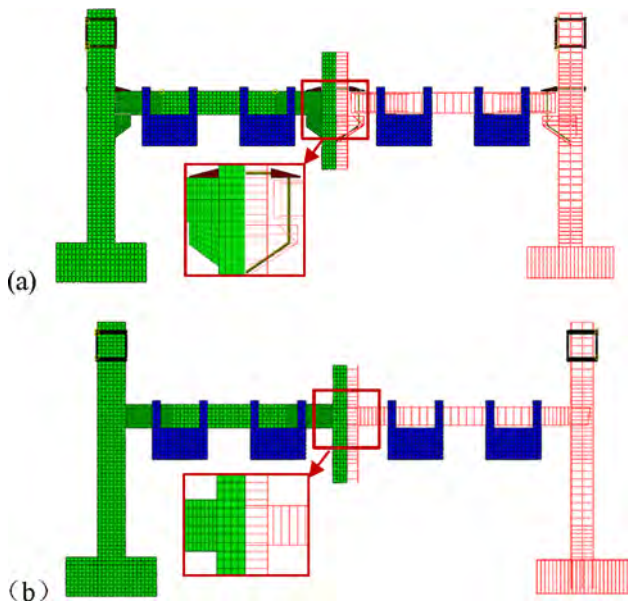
Analysis elements of reinforcement and concrete: (a) PC specimen; (b) RC specimen.
